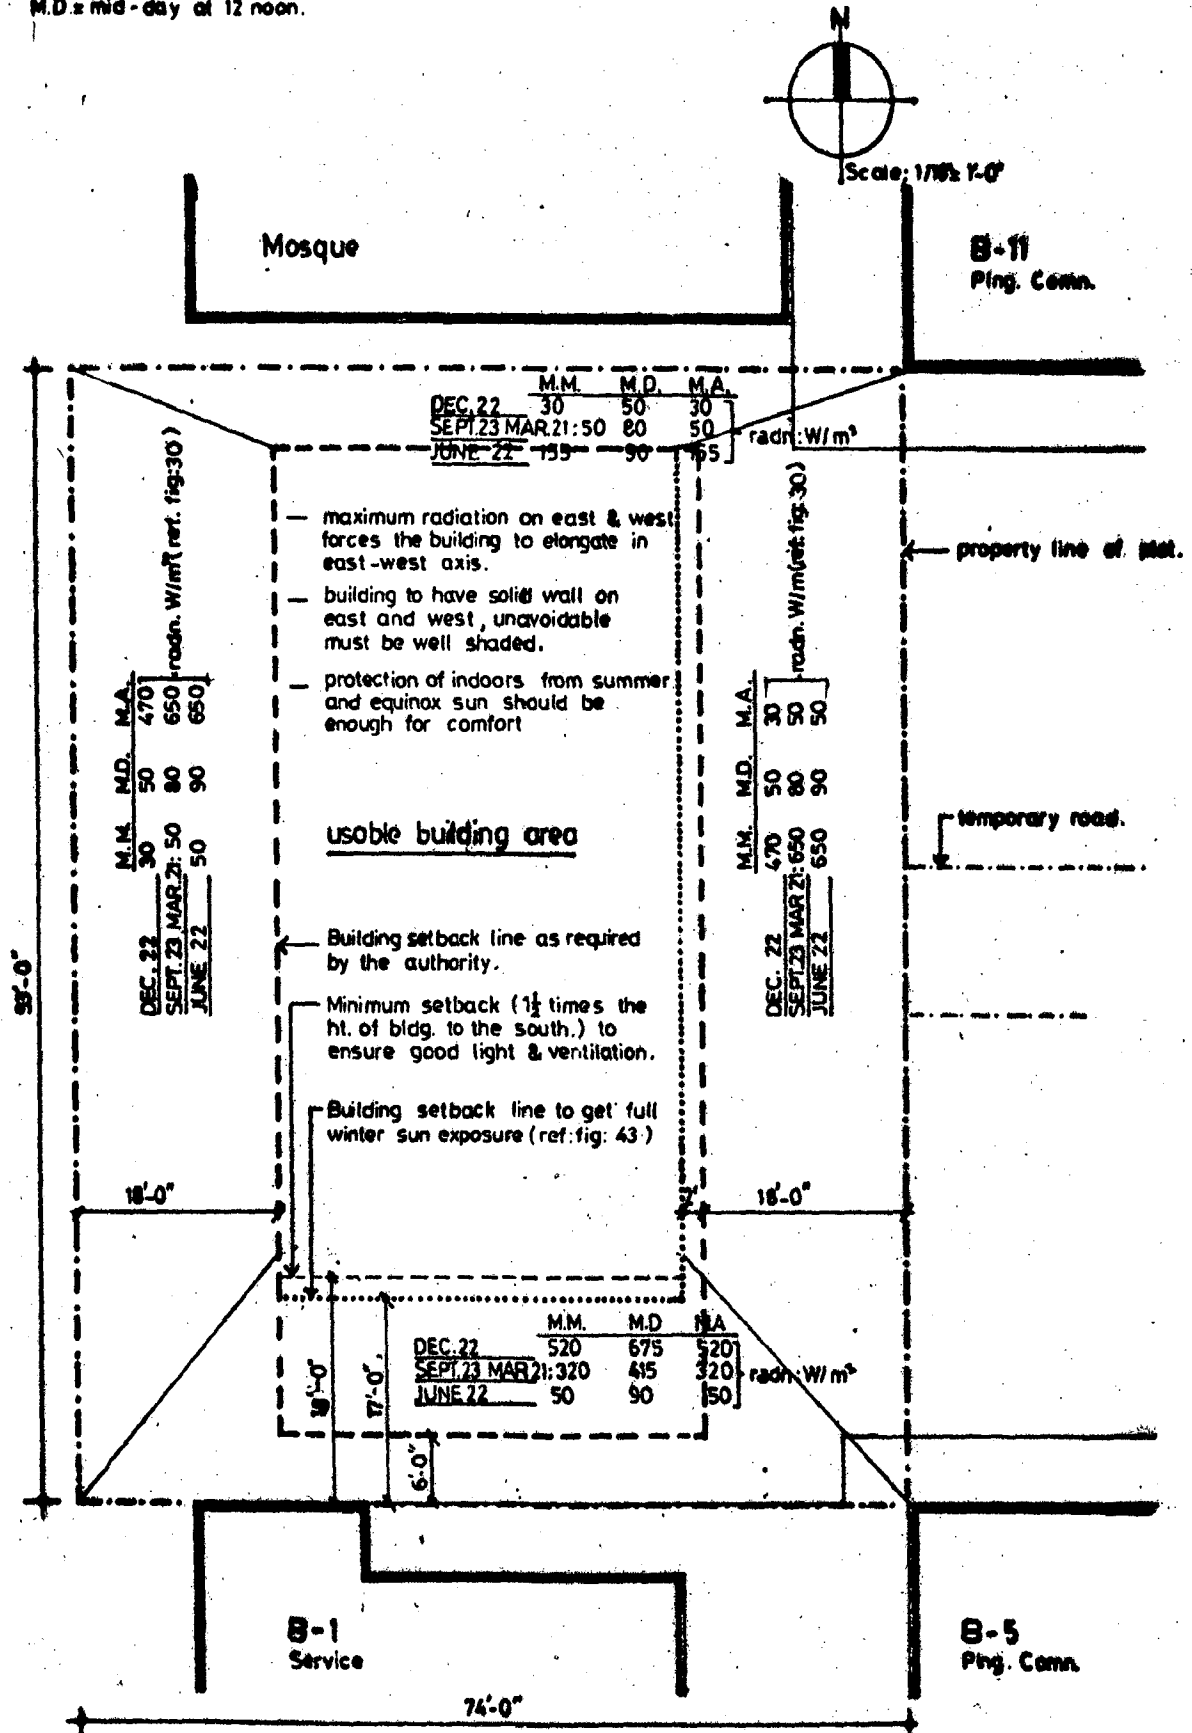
Radiation plan for SDE's office at Planning Commission Campus, Dhaka
